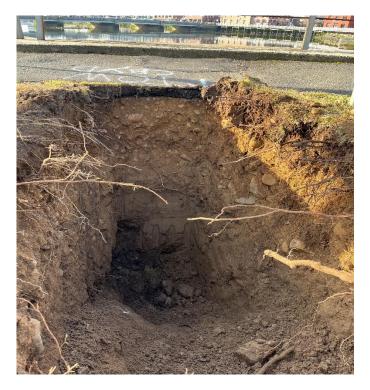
Test Pit TP-2, looking southwest toward the seawall.
